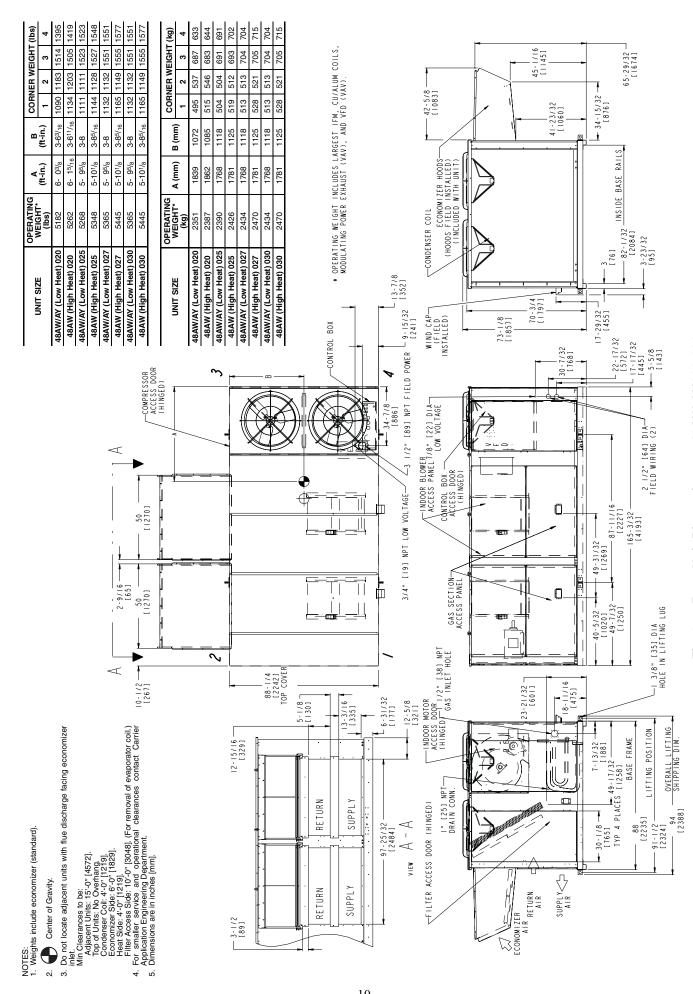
Base Unit Dimensions — 48AW,AY020-030
